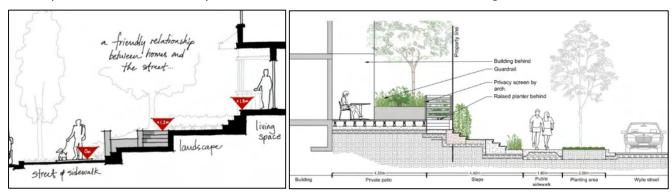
Example sketch from OCP of desired streetscape section (left), section from proposed development plans (right).
